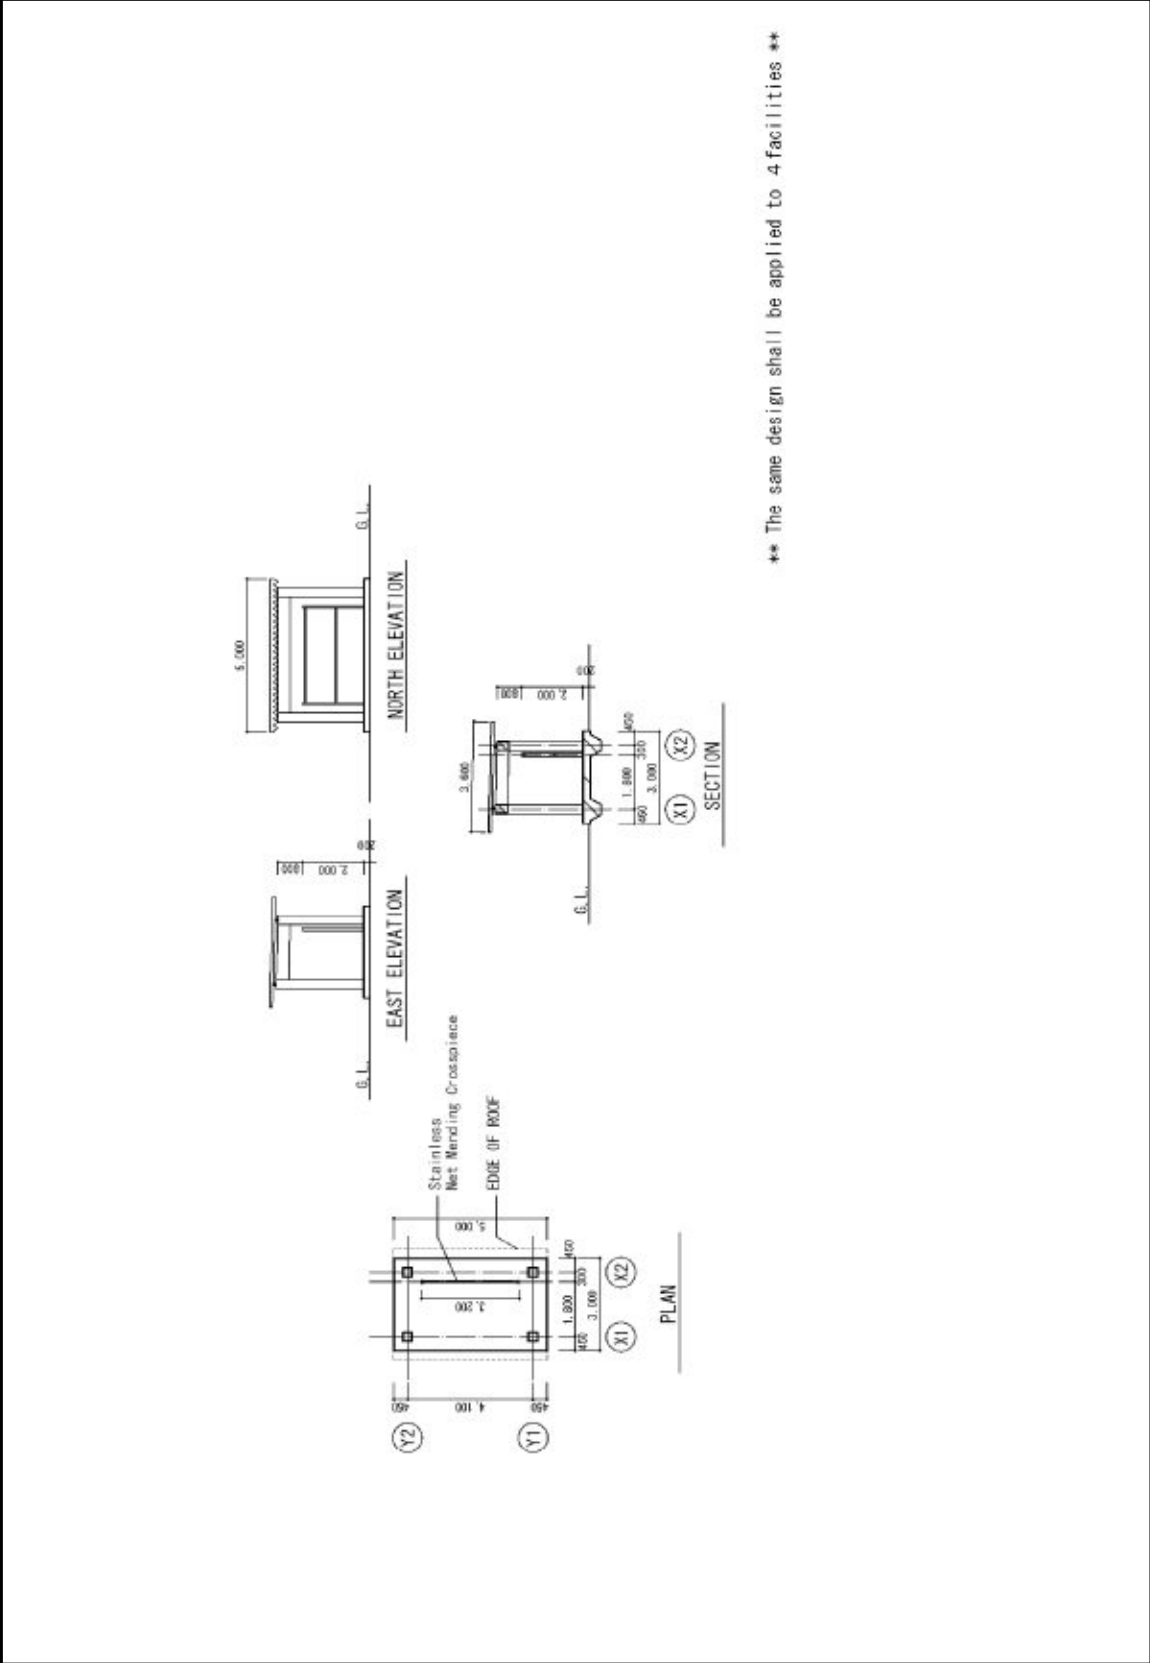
(20) Layout • Cross-Section • Elevation for Workshop
